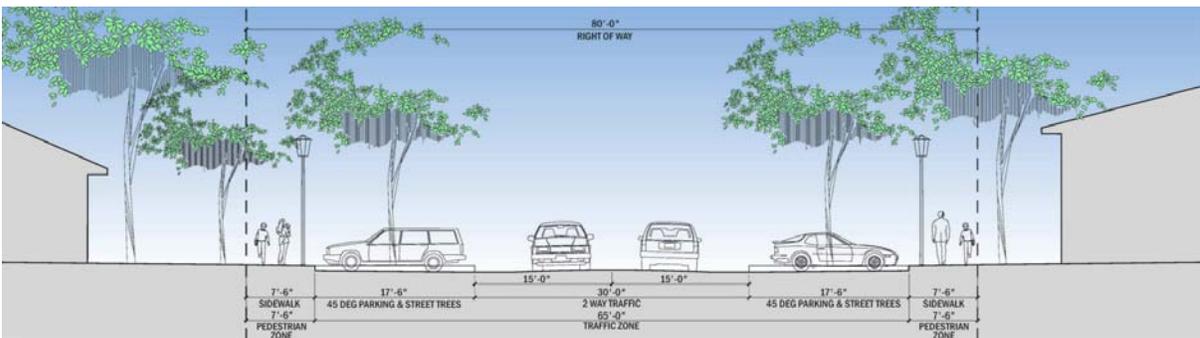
Proposed section, all other Southwest Downtown Plan Area streets\
